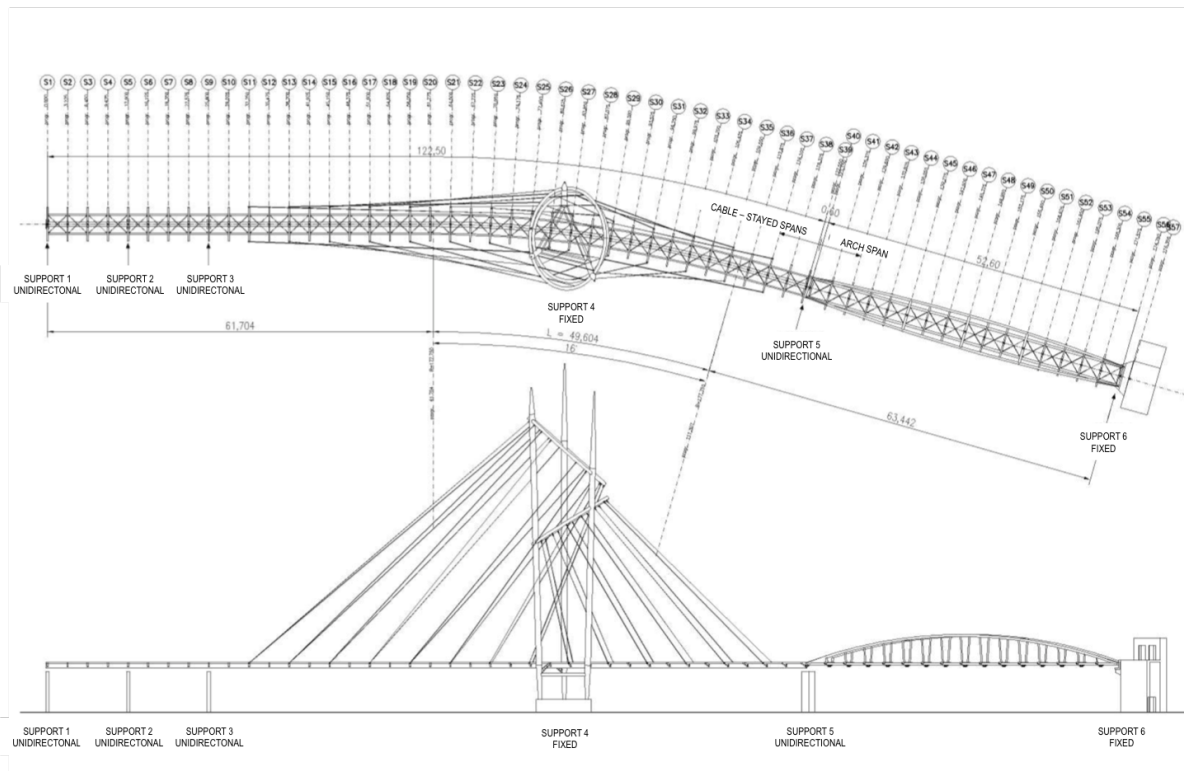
Schematic representation of the footbridge. Plan and elevation [132].
